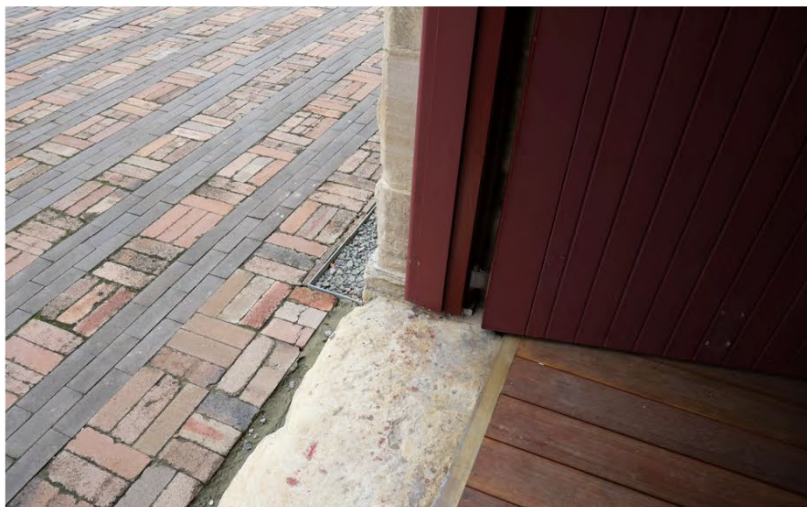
Detail view of the sandstone sill to the double doors on the eastern elevation.
